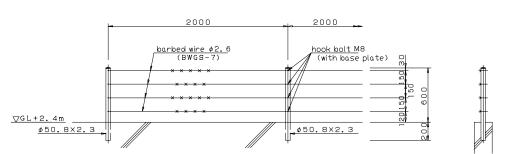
Example of Installation of Erect Top Guard (Barbed wire) on the Wall
